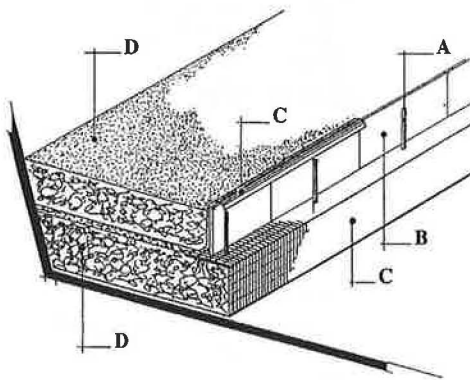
Wrap around with timber tables and steel bars: A) steel bar; B) wooden board; C) geogrid; D) compacted soil.
